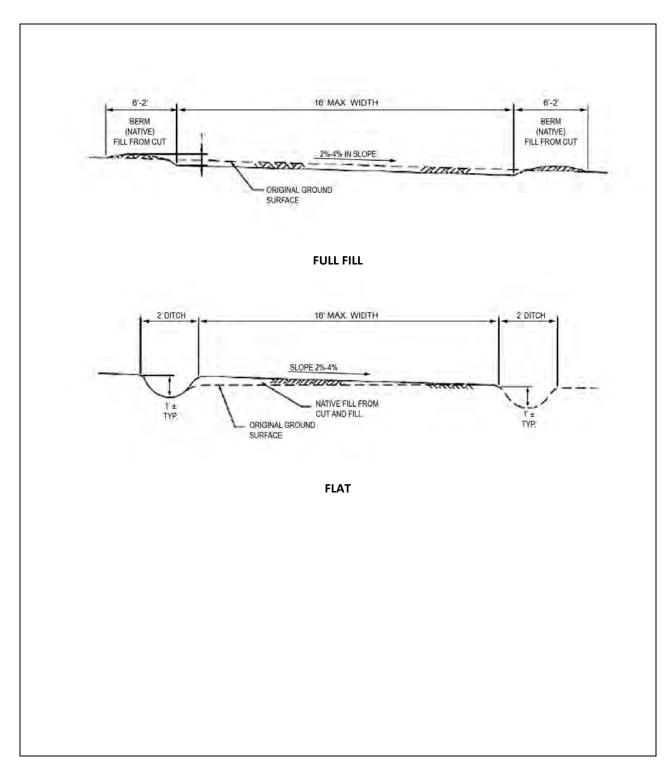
TYPICAL ROADWAY SECTIONS
